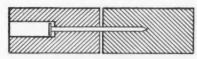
Cross Section Showing how two Adjoining Staves are Spliced Together
